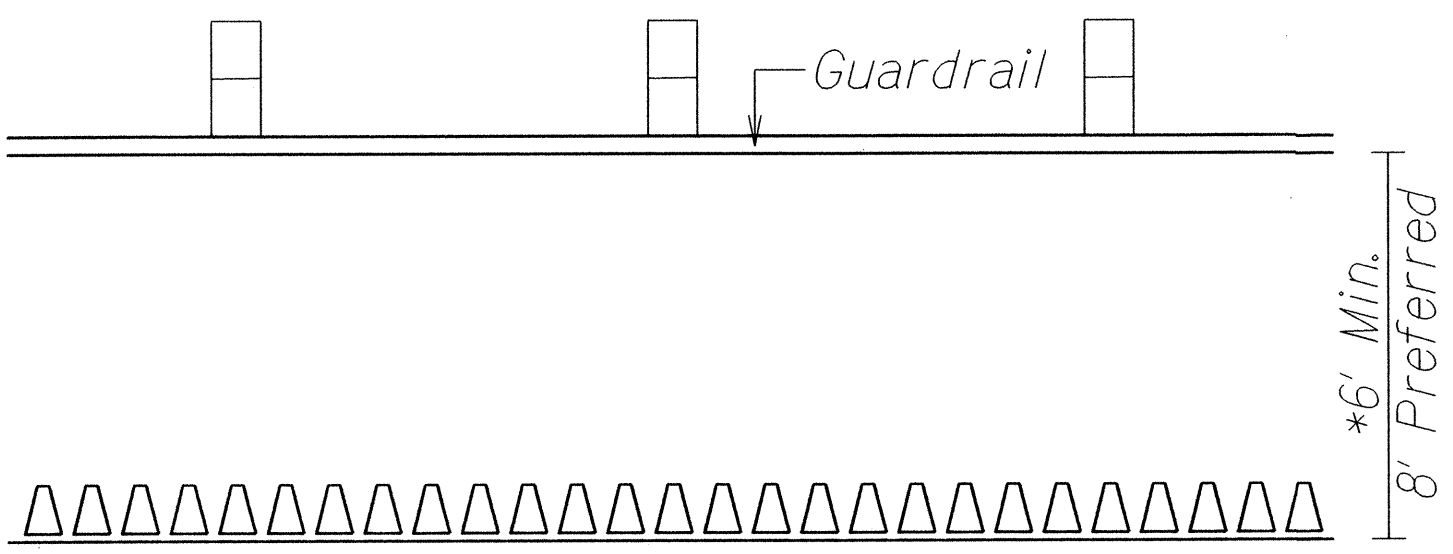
DETAIL - SHOULDER MILLED RUMBLE STRIP
